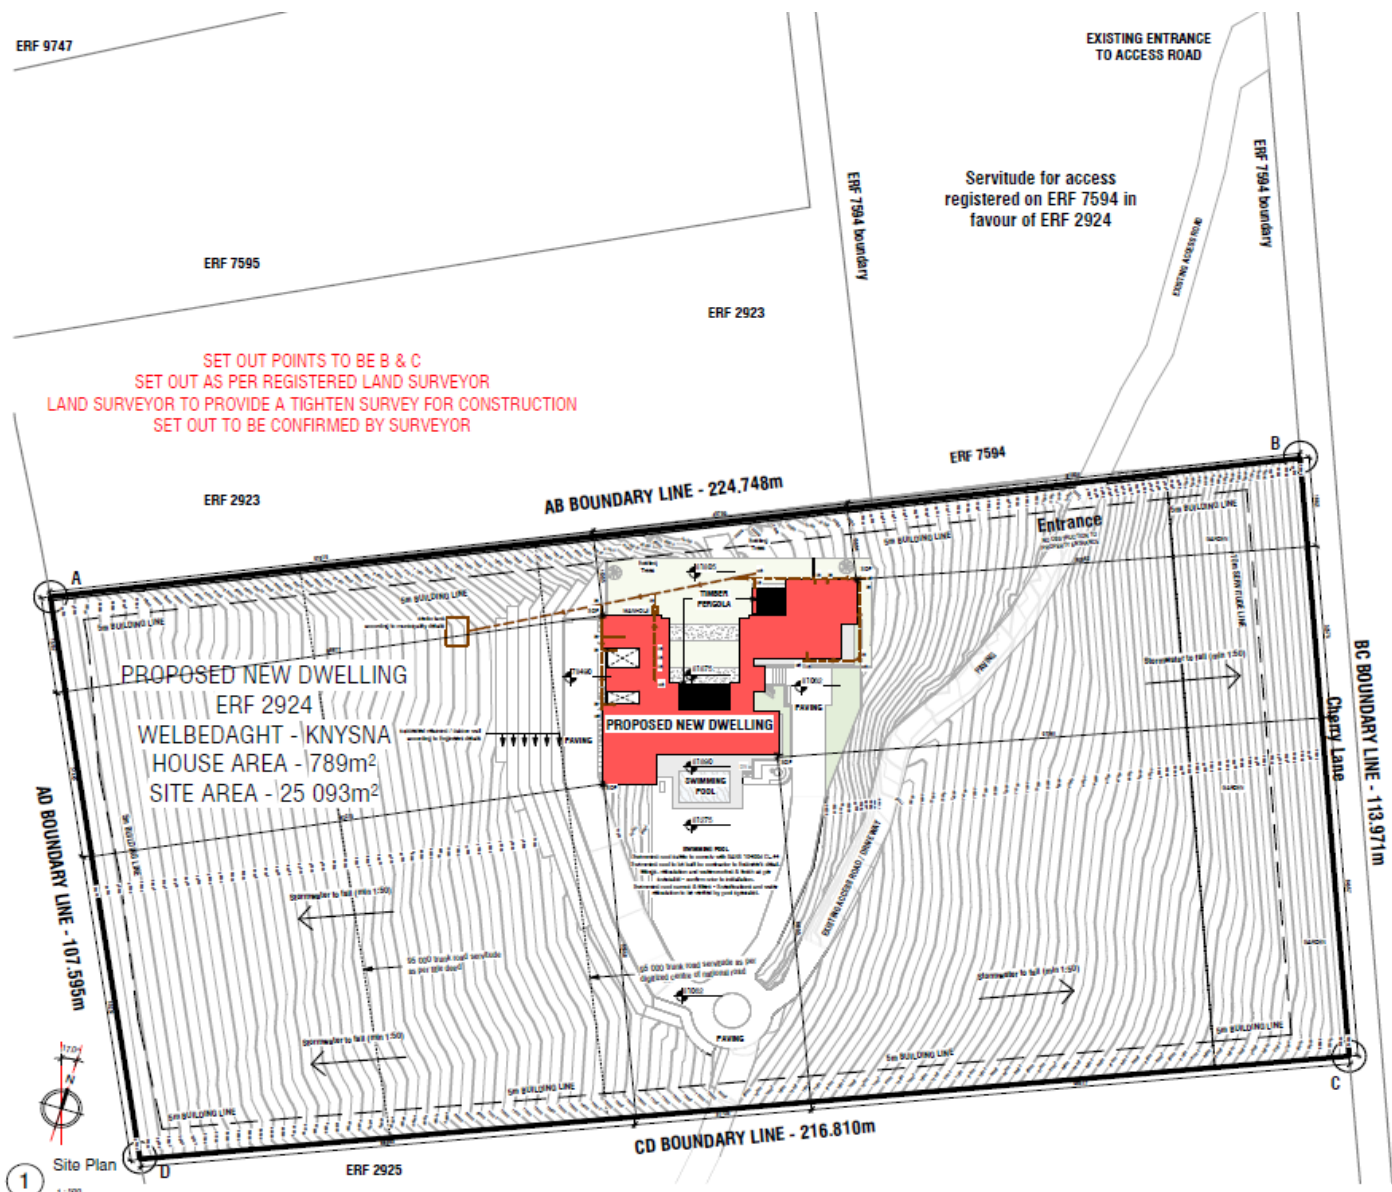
Revised site development plan with access road (Mathews + associate architects, 2024)
